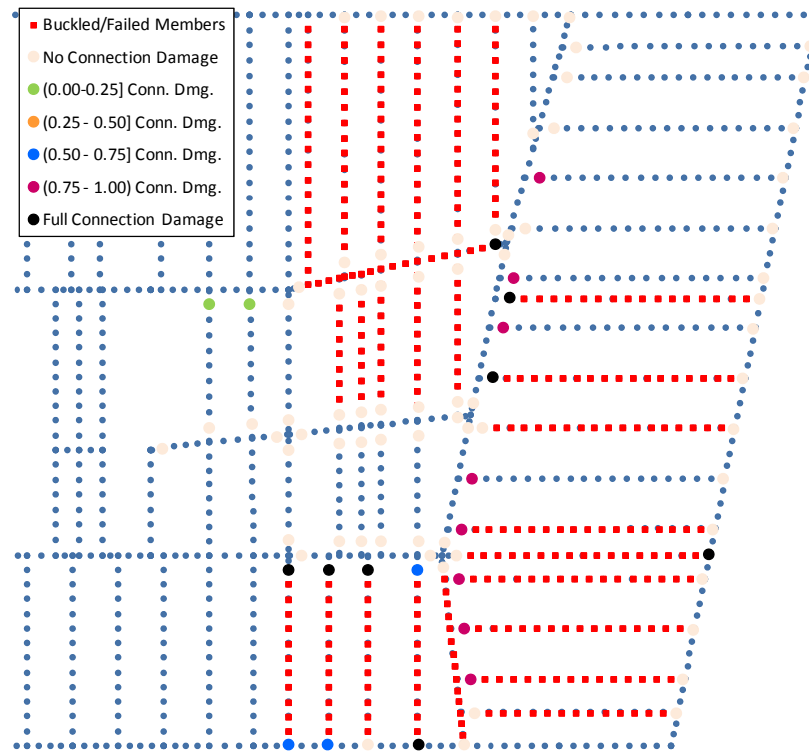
Damage state of connections, beams, and girders in Floor 11 at 4.0 h for Case B temperatures.
